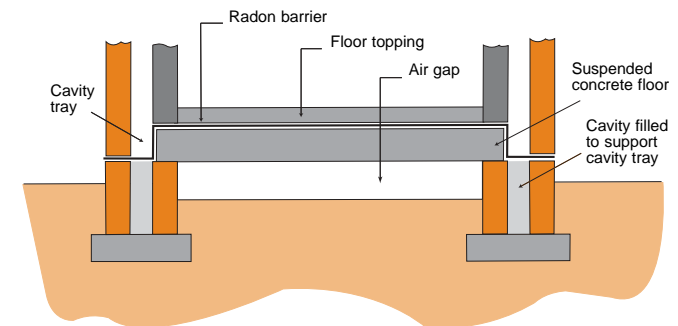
Figure B: Enhanced damp-proof membrane providing basic radon protection to a suspended concrete floor
